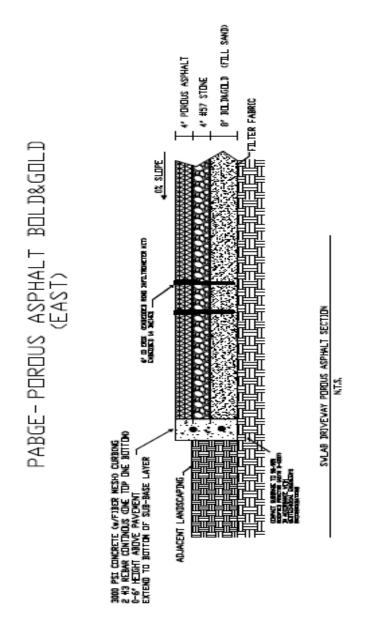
Cross-sectional view of Pervious Asphalt Bold & Gold (PABG)
